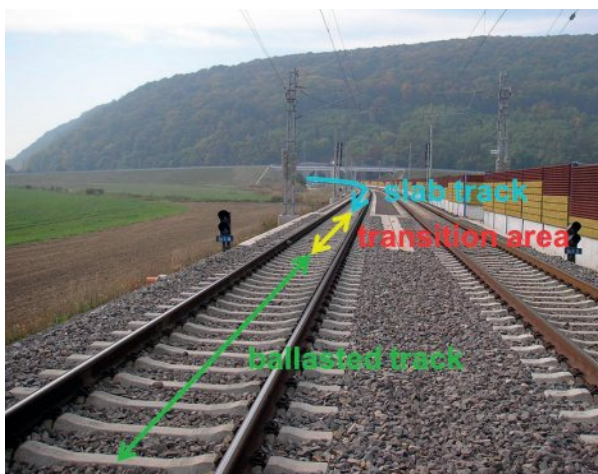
View of the transition area built between the structure of the slab track and the standard structure of railway superstructure
